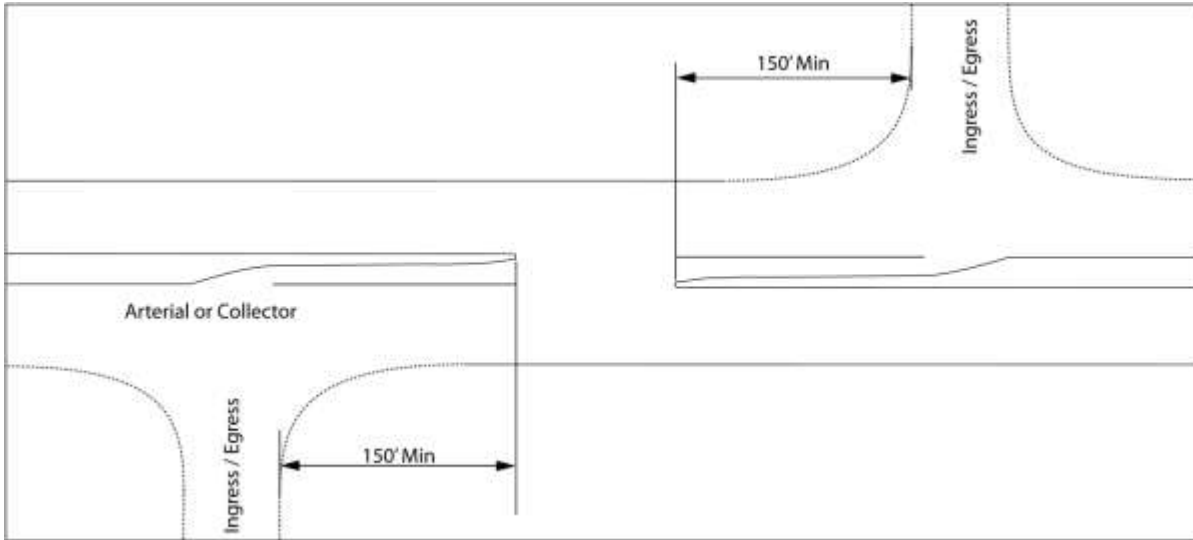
Divided Roadway, 150' Offset Driveway Locations – Median Opening
